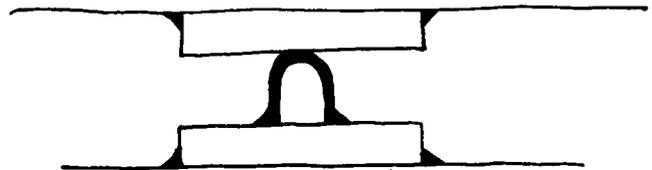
Steel-lug bearing. Works by brute force on short spans; prone to freeze and lock up.
